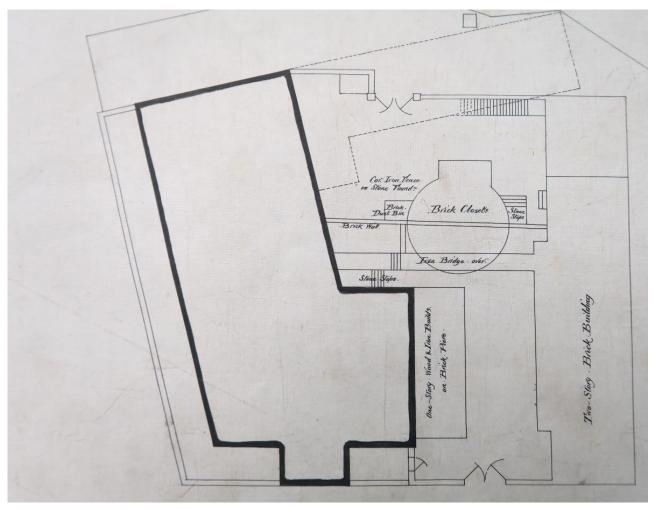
Site Plan showing buildings, dated 1897 (original Treasury Building shown heavily outlined) Source: State Records NSW, Item No. PB25/7, dated 28 December 1897
